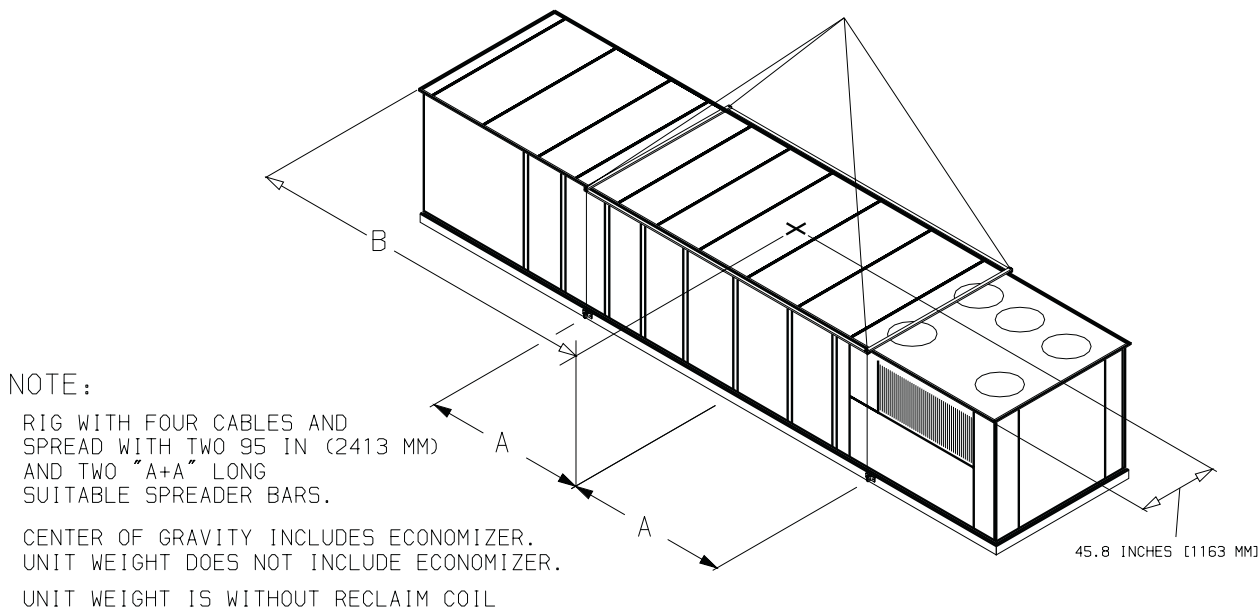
Rigging Label — Size 055,060 Units (Extended Chassis)
